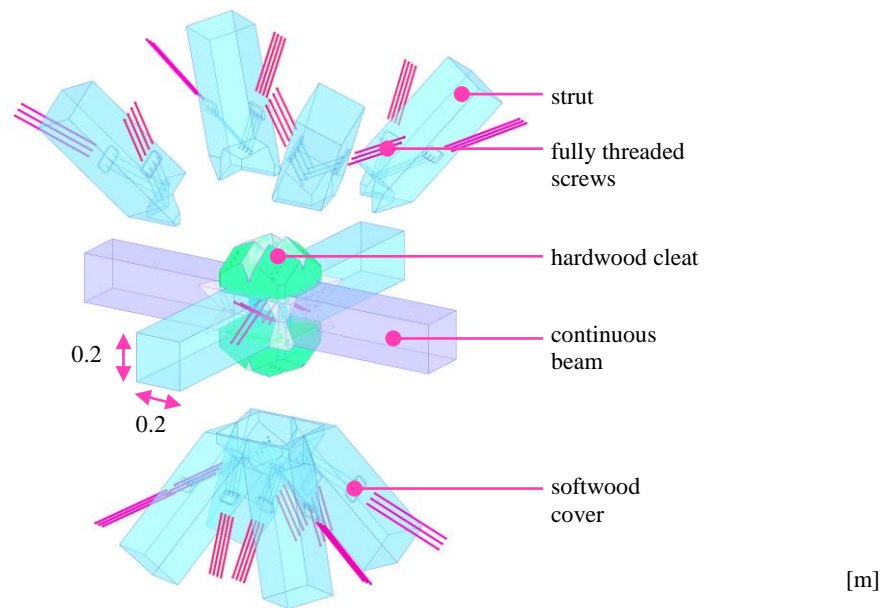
Example of a complex timber joint with twelve beams connected in one node with hardwood cleats on the top and the bottom of the continuous beam.
